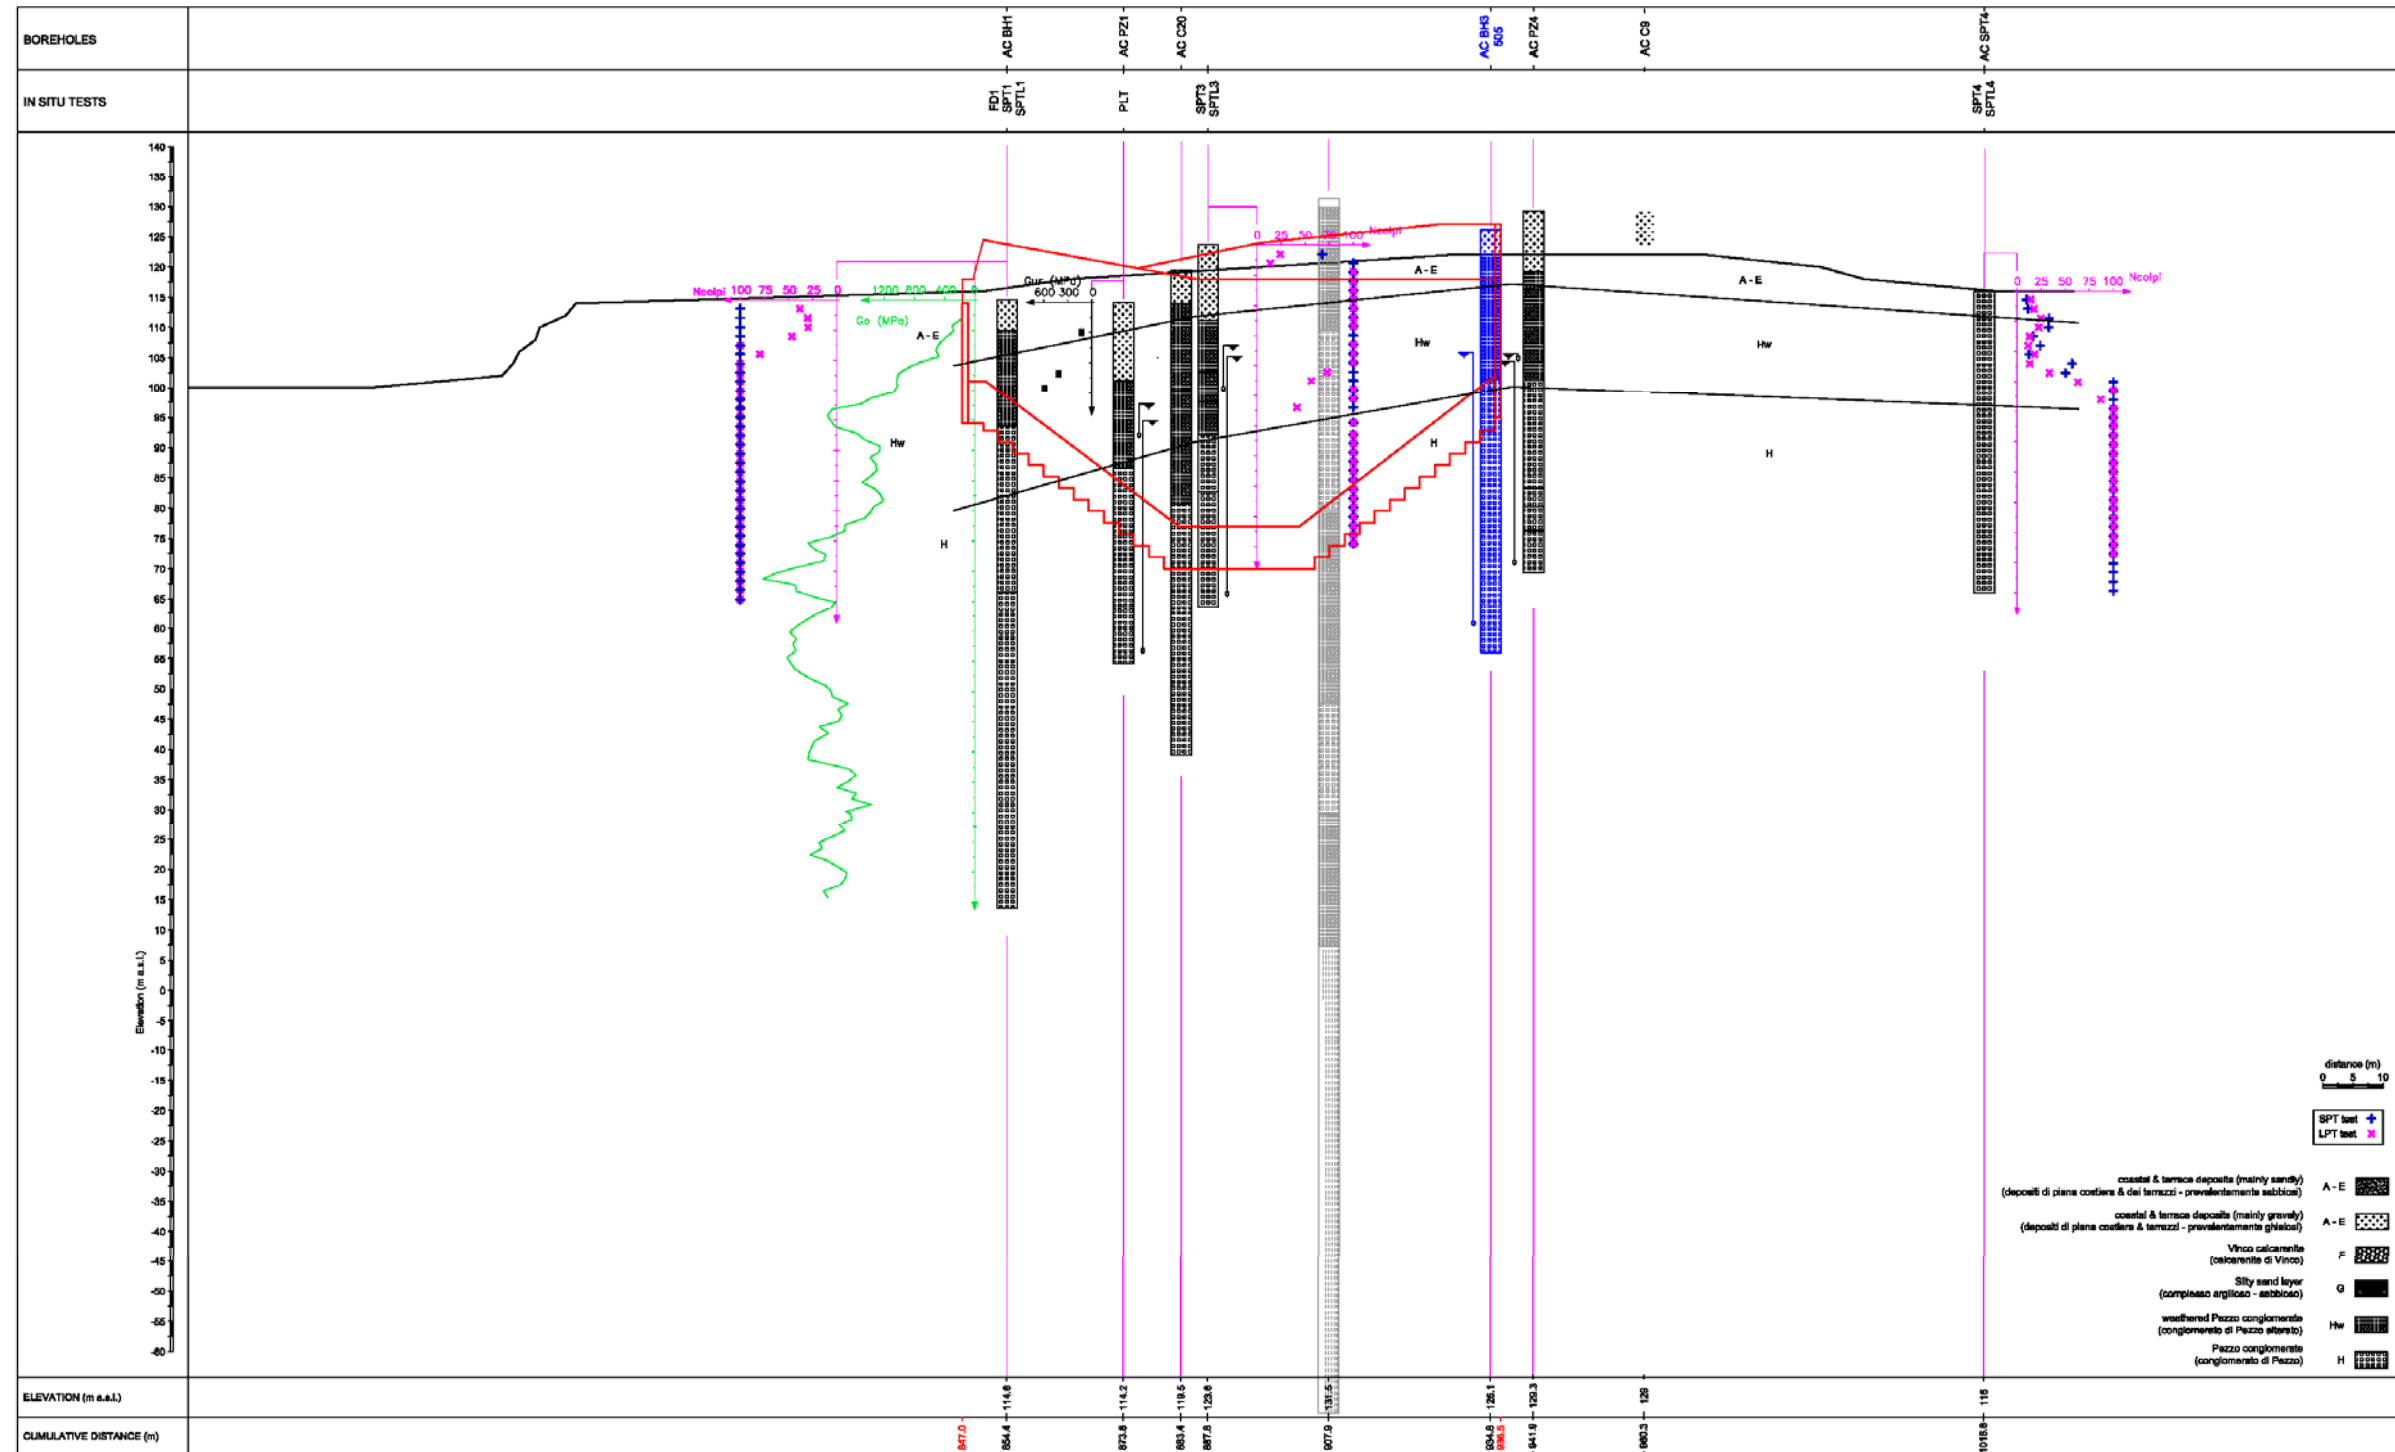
Calabria shore - geotechnical longitudinal section at the anchor block
